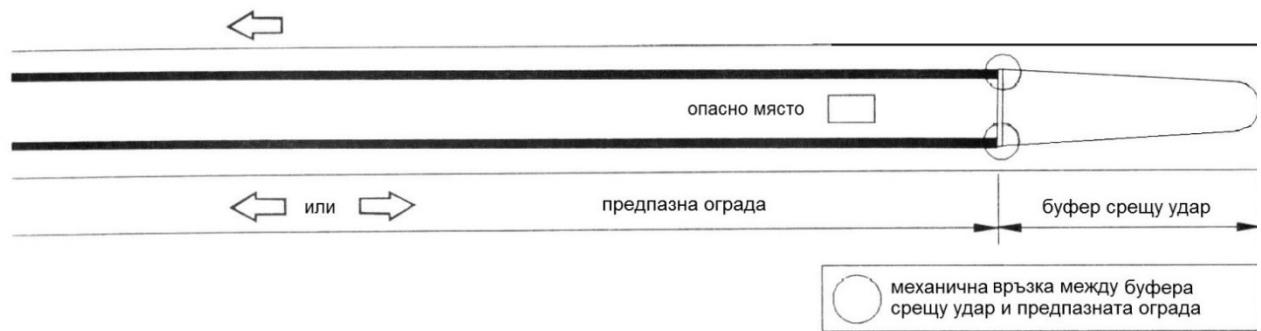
Restraint system built bilaterally in the median dividing strip of one-sided road restraint system with shock absorbing buffer for a start
